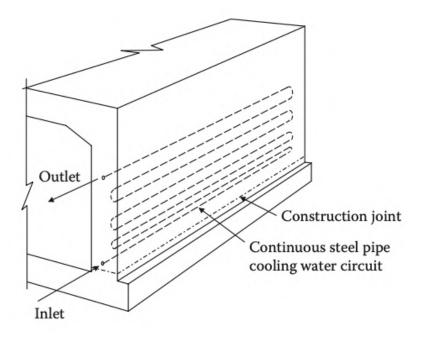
Arrangement of cooling pipes (Lunniss and Baber, 2013)
